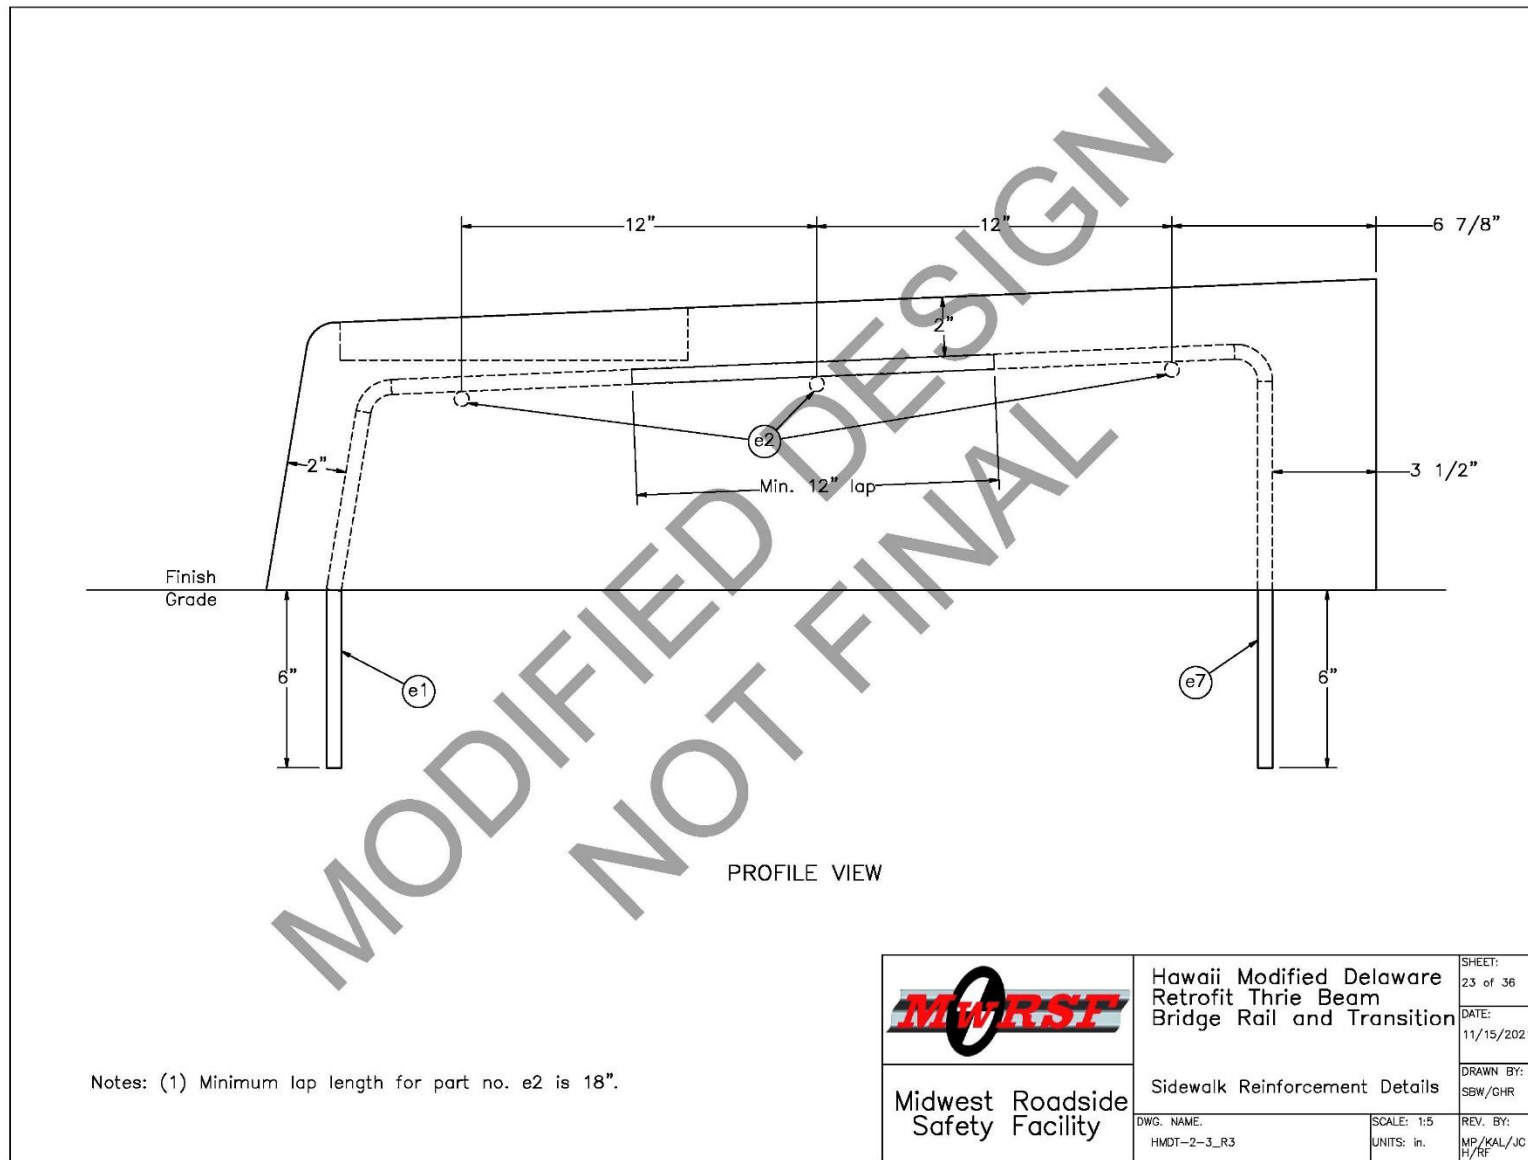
Sidewalk Reinforcement Details, Test Nos. HMDT-2 and HMDT-3
